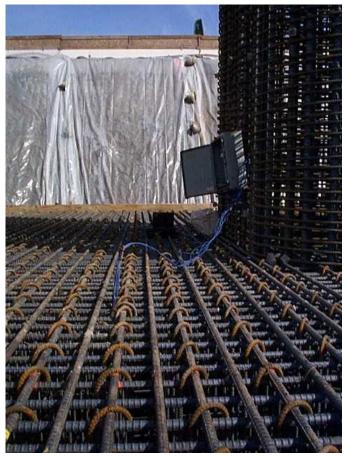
Typical footing and bridge column rebar prior to mass pour.
